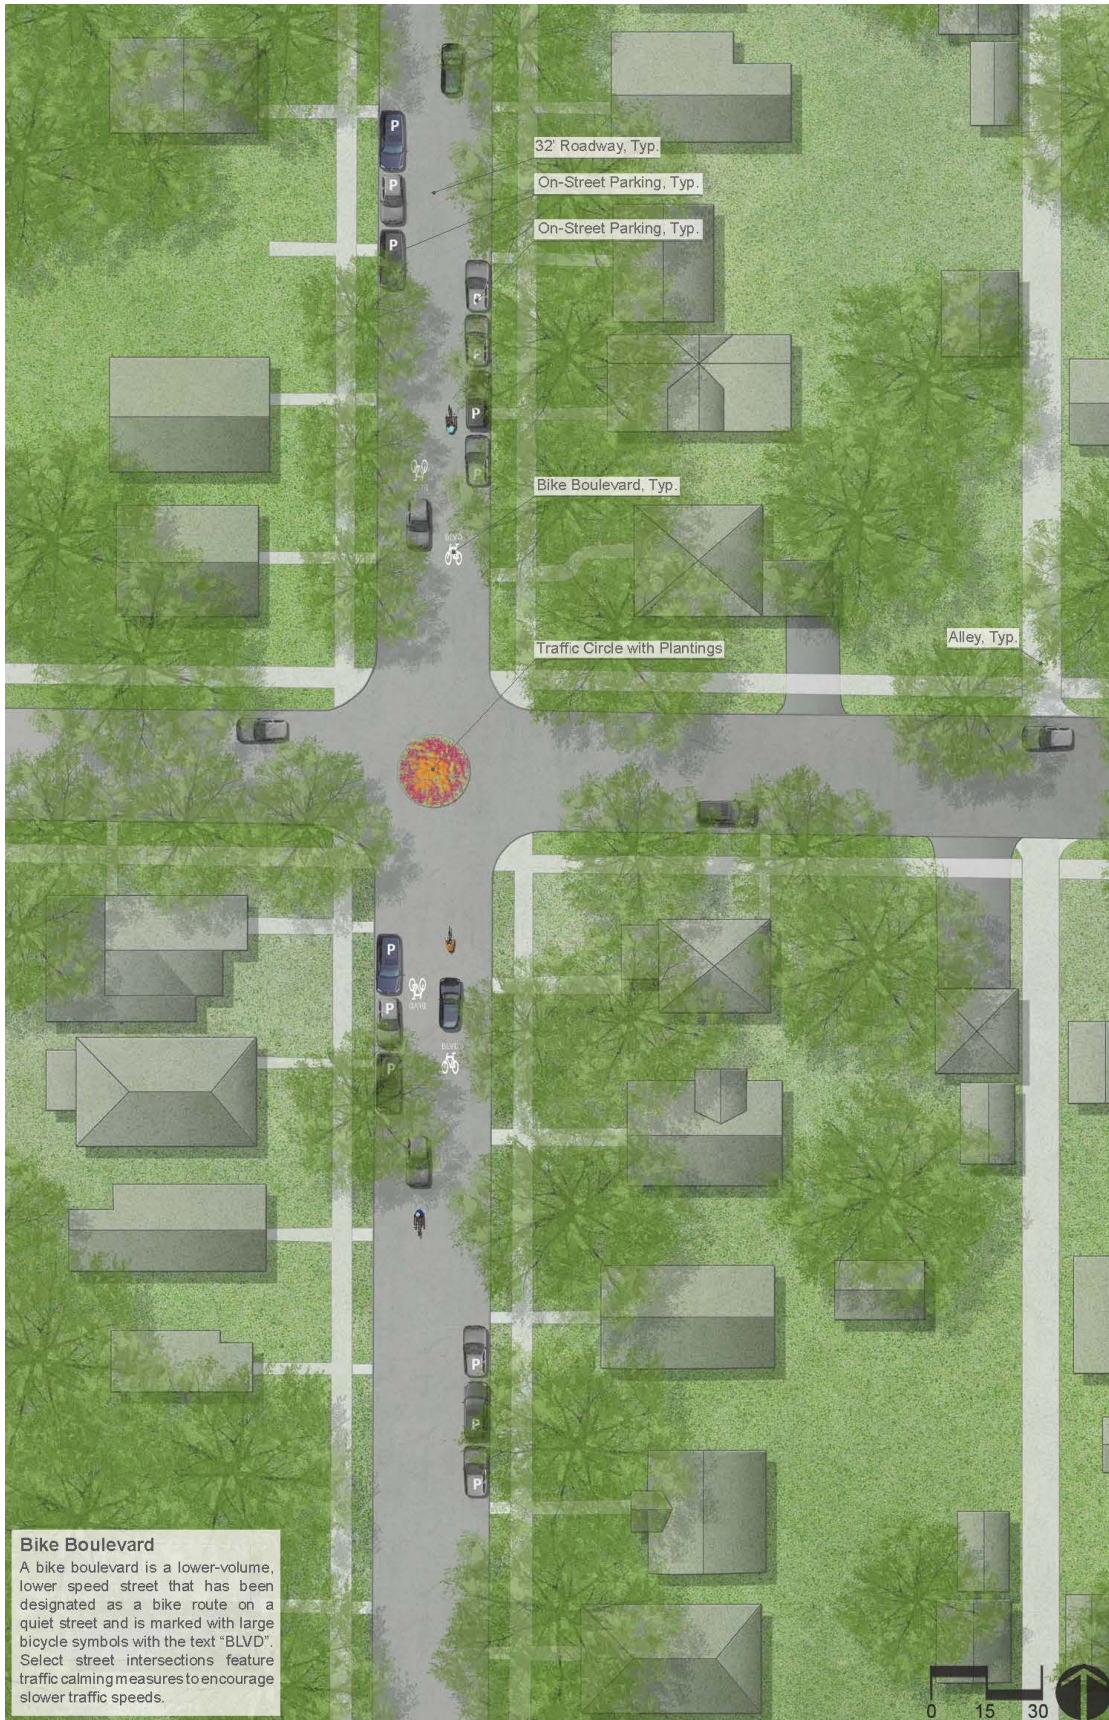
BIKE BOULEVARD: PLAN VIEW
